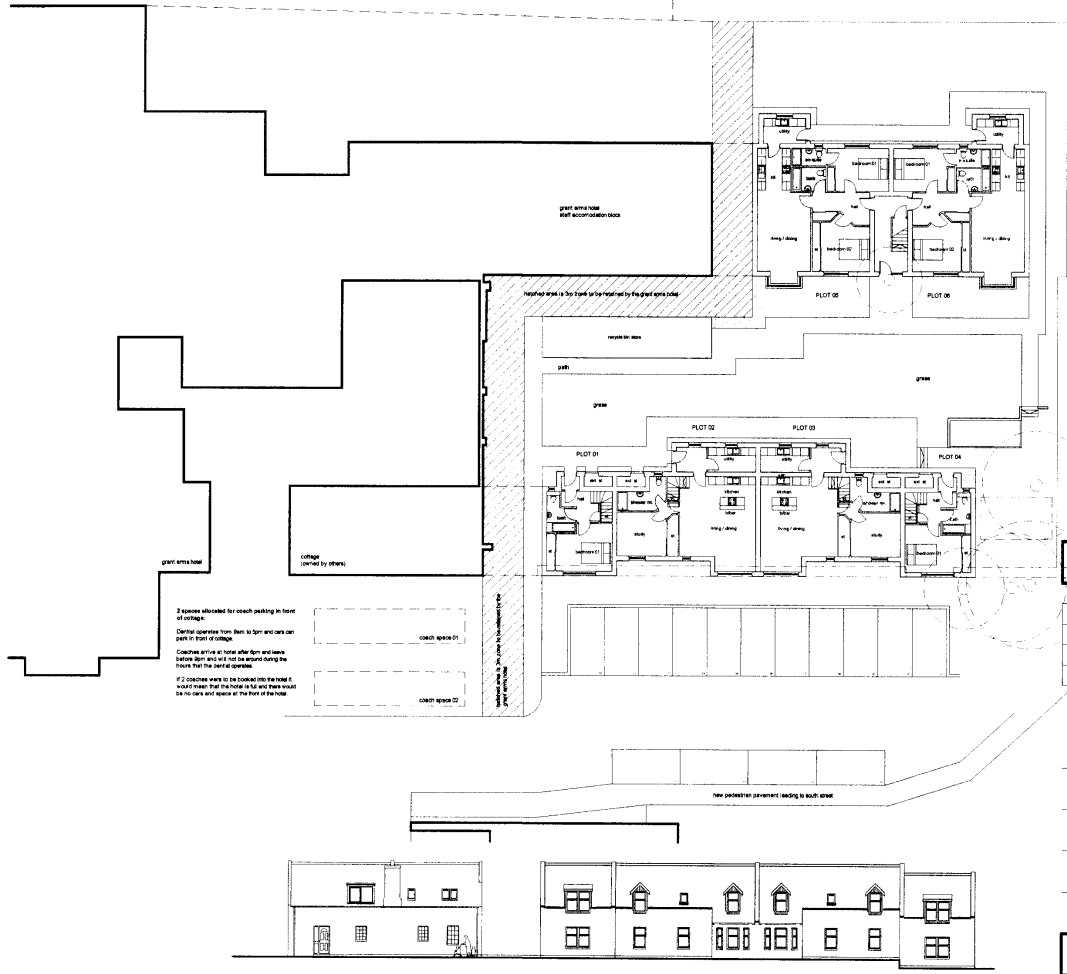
Indicative Site Layout and Elevation for Terrace of 4 Houses
